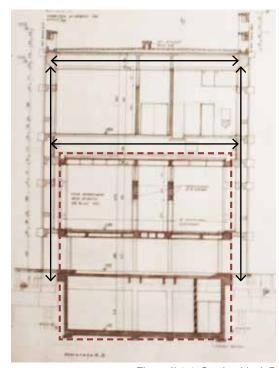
Section block B (adapted from Antwerp: APA).
